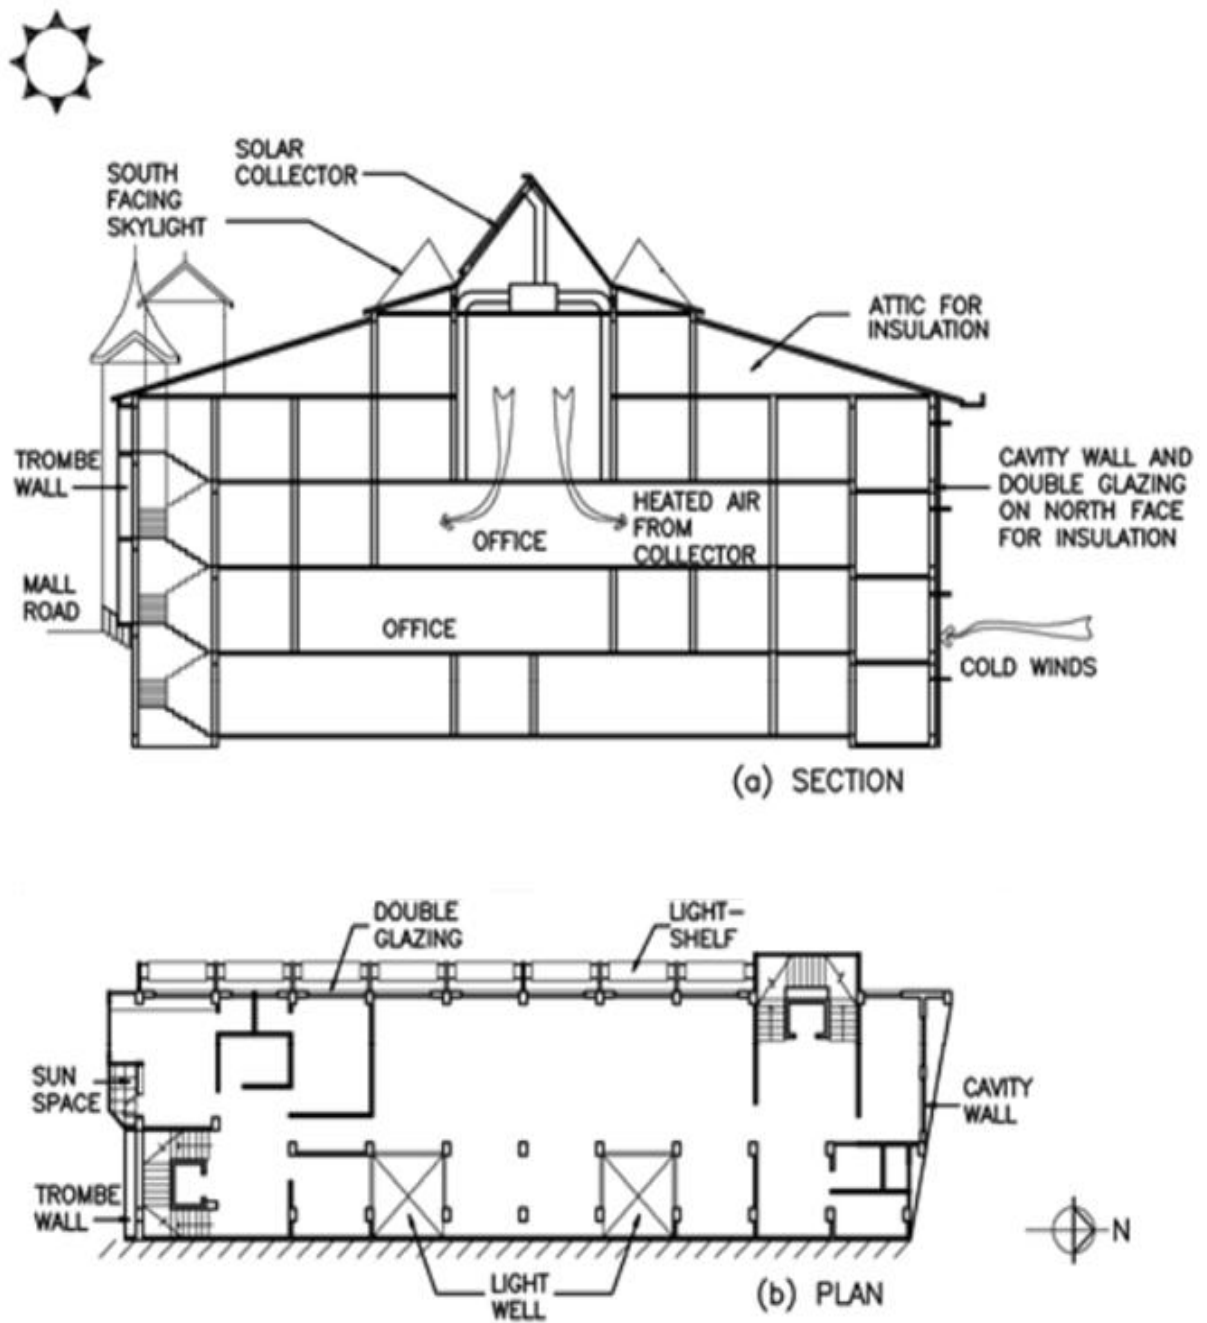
Section and Plan of H. P. state co-operative bank, Shimla
